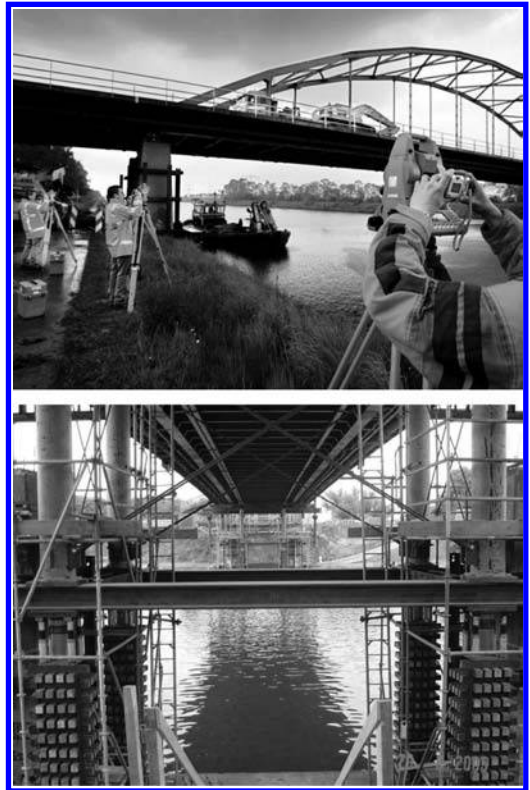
Bridge load testing (top) and jacking-up the superstructure (bottom).
